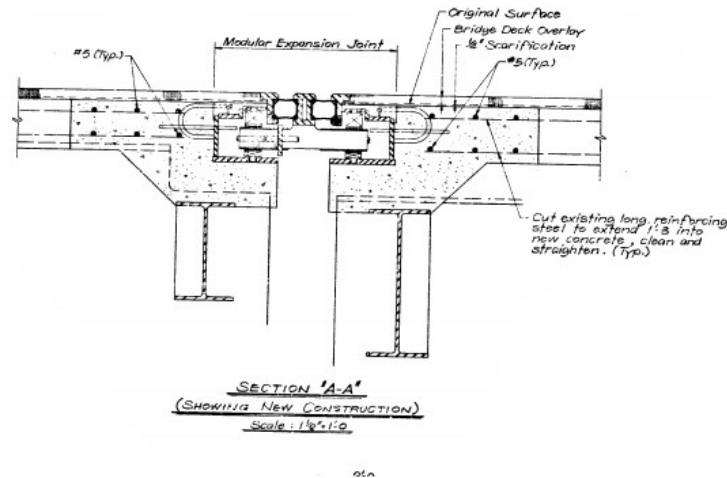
Expansion Joints over Piers 5 and 8 for the Bridge (NBI 33240) (1978)
